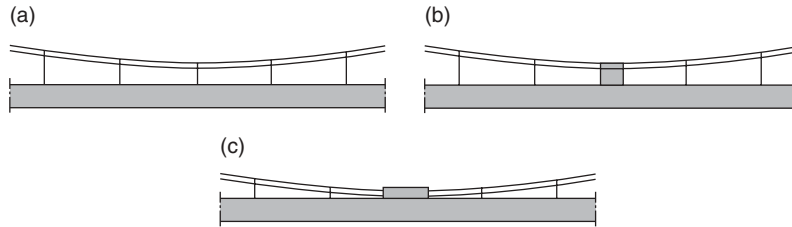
Central clamp at midspan and hydraulic buffers at the anchor blocks (Storebælt East Bridge)
